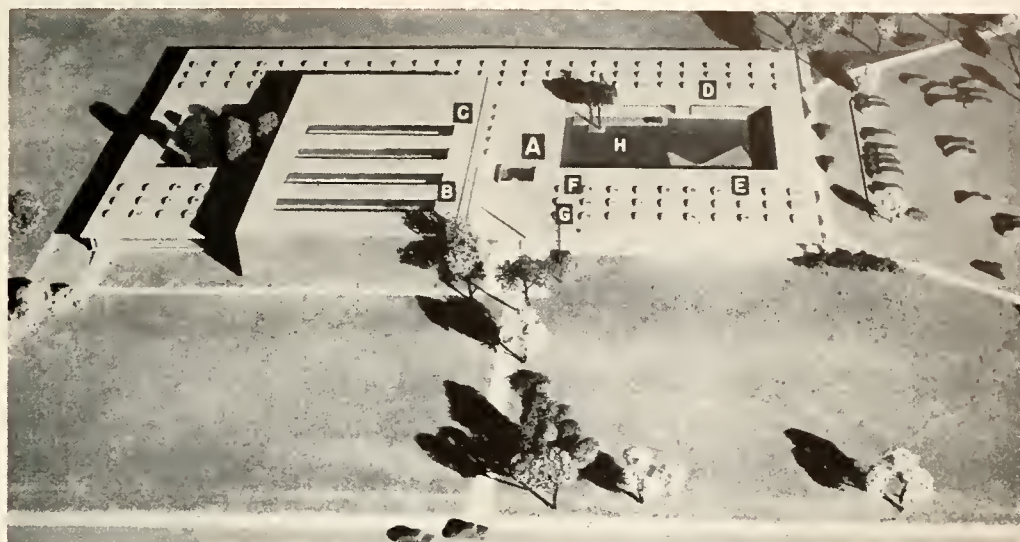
E: This sketch is a possible layout which should come very close to the funds available. There are four main buildings—three double classroom-type wings as illustrated in sketches 15-A, 15-B, and 15-C, plus the Community Building as shown on this page.
